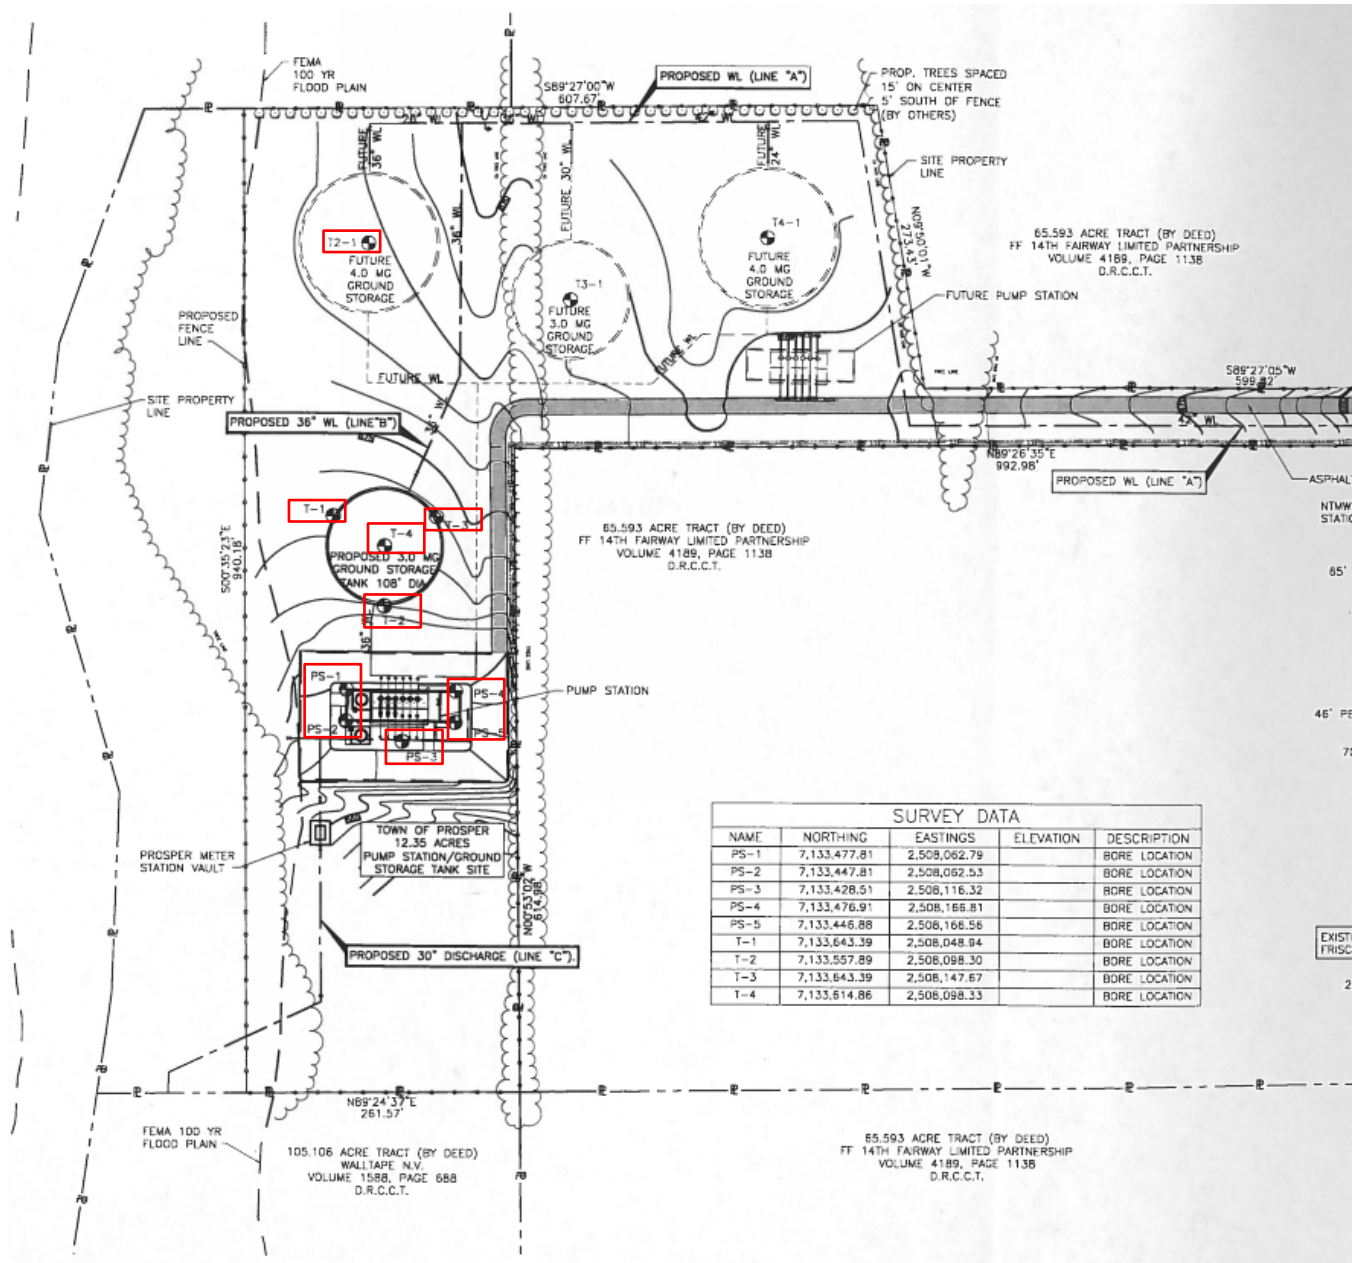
Previous Boring Location Plan for Existing Pump Station and 3 MG GST (PRP05200)
